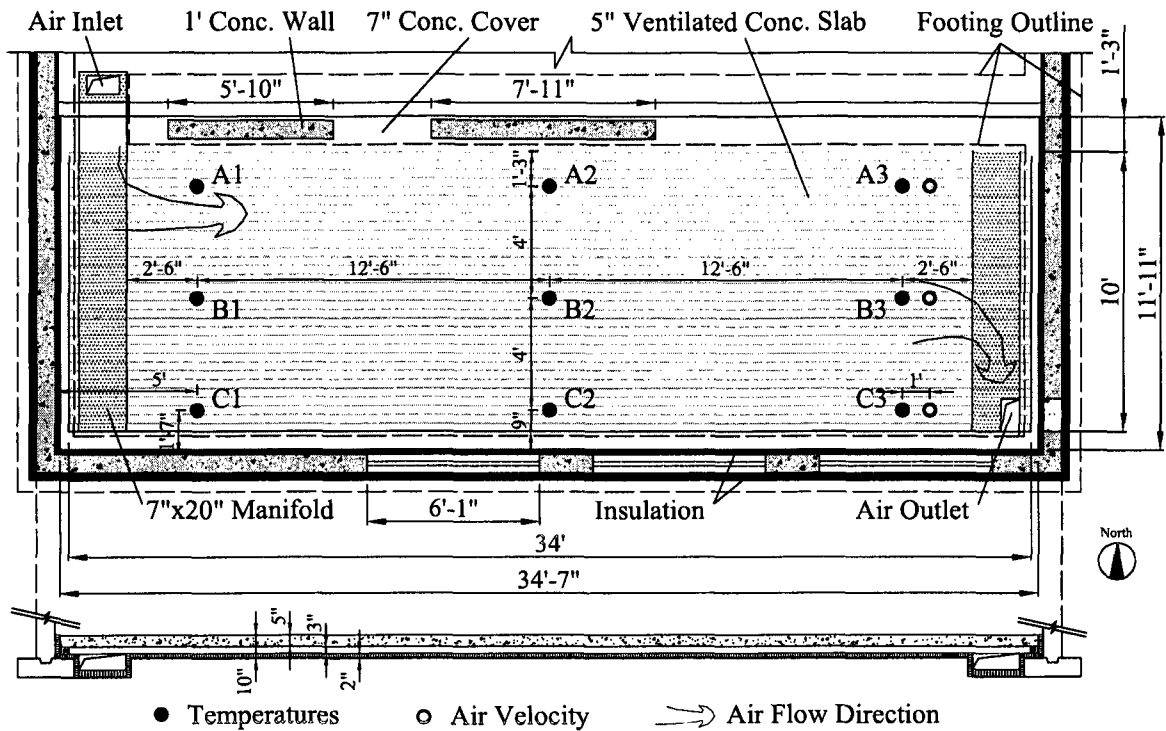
Plan and longitudinal cross section of VCS, and monitoring locations
